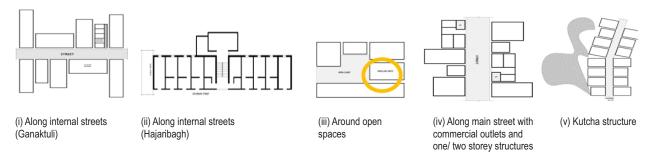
Pattern of Arrangement of Dwelling Units (Source: author's survey, 2008)
